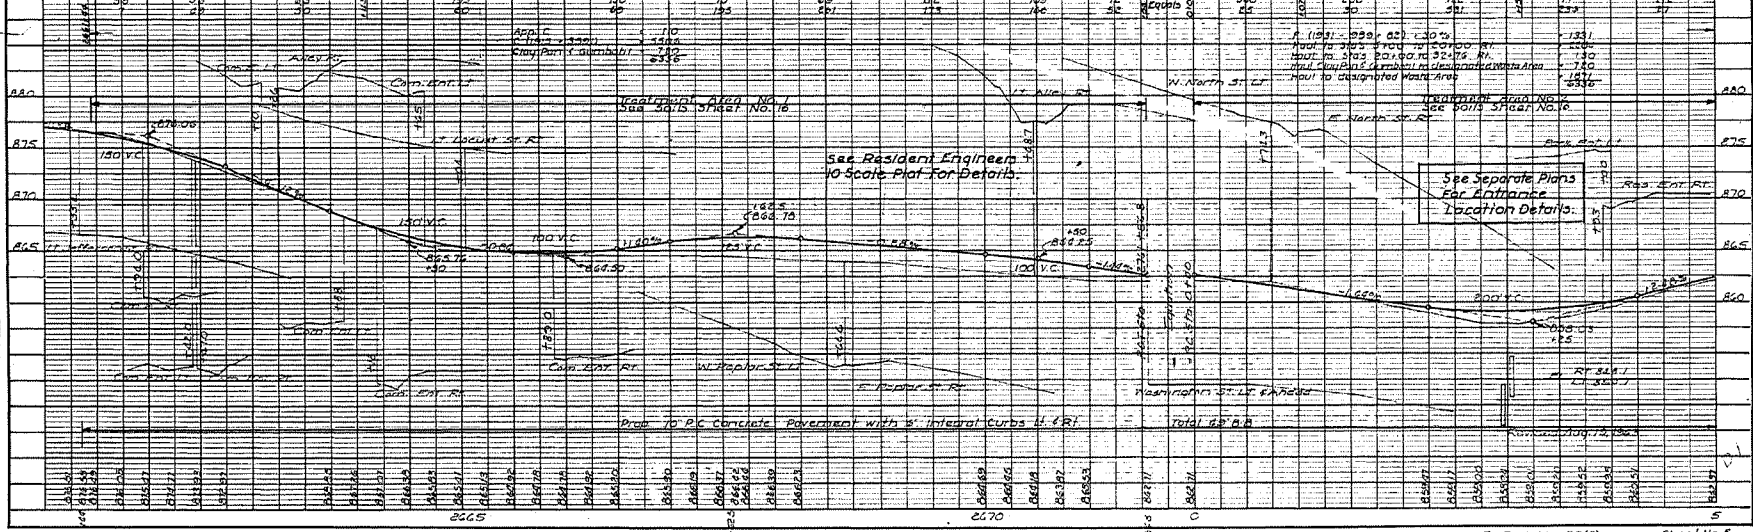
PLAN PROFILE & P.A.R.C. SECTION
